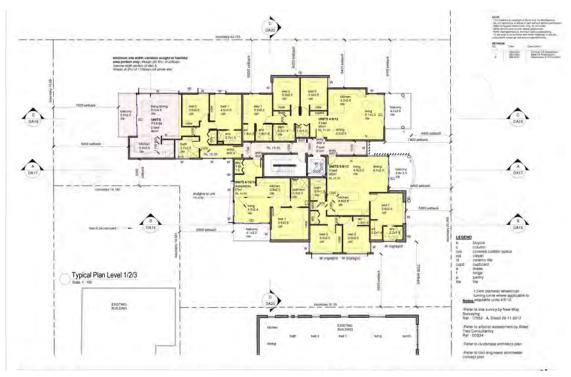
Typical Plans Levels 2/3/4 - Proposed (Source: Borst & Co Architecture)
